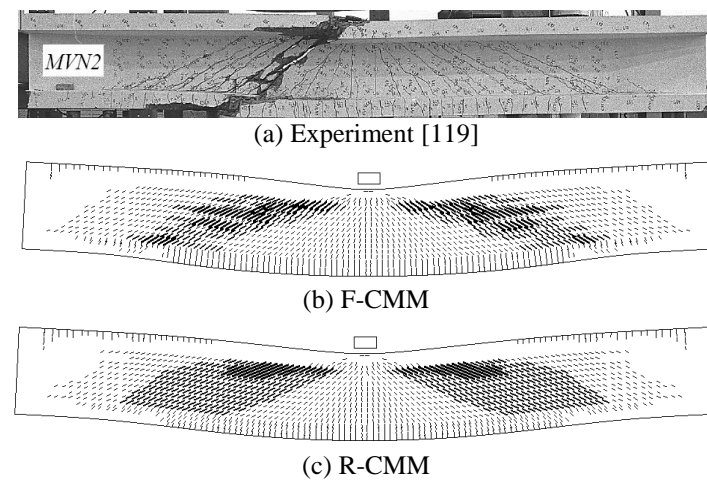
Beam MVN2: cracking patterns at failure.
